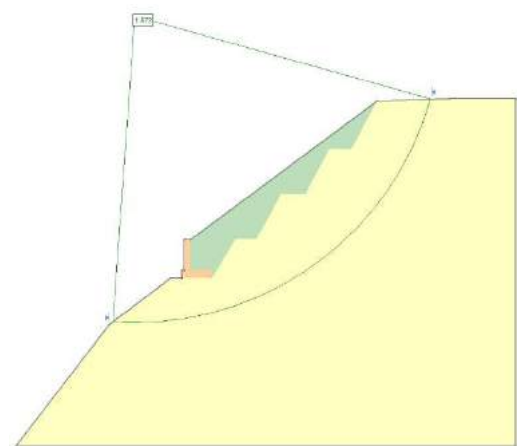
Slope stability check with RC wall and rock material behind the wall ($F_s = 1,872$)
